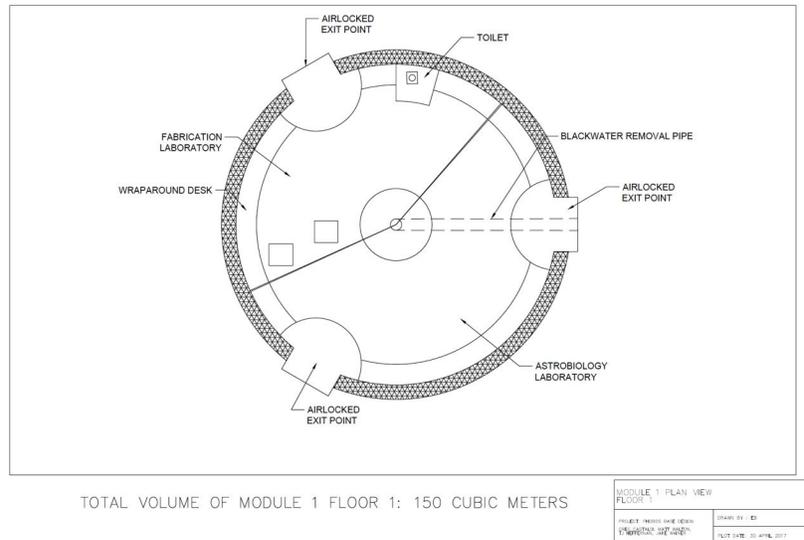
Floor plan of the UVM “Module 1” foundation module.
